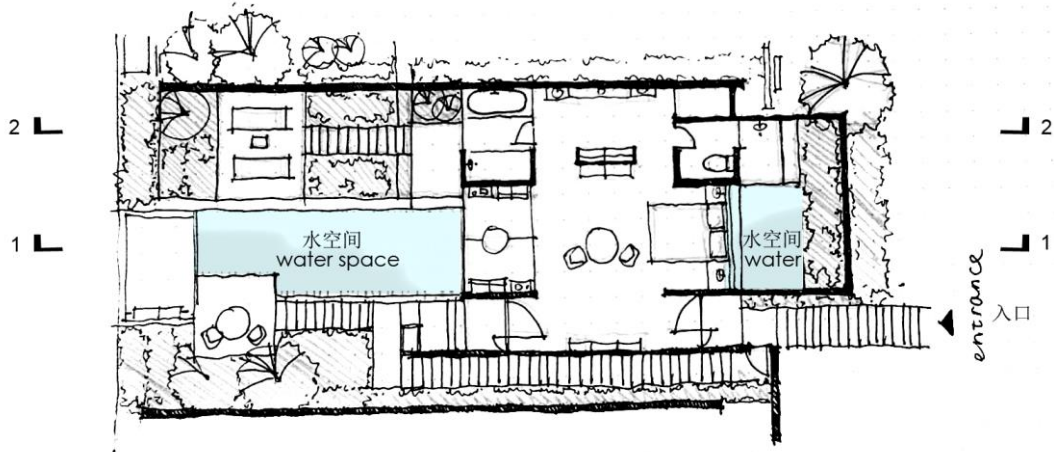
Guest room plan layout in Alila Hotels & Resorts
